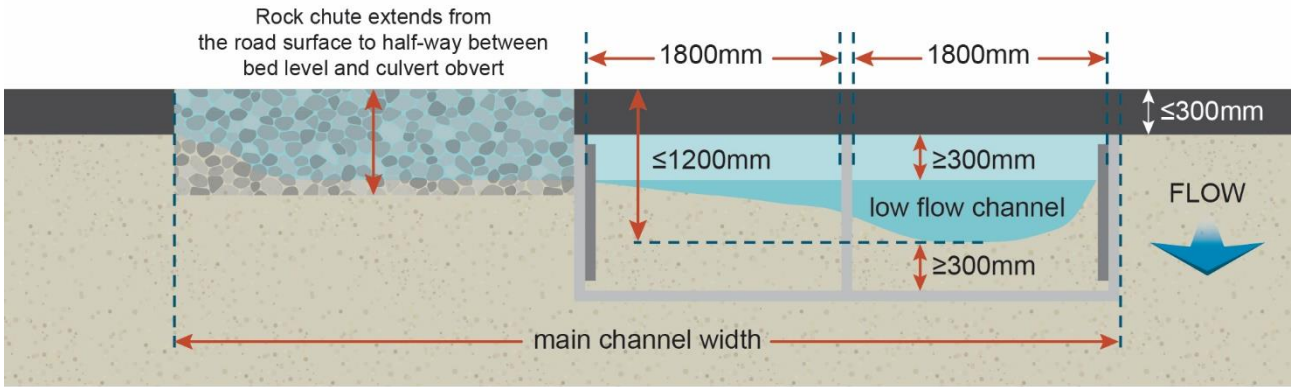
Culvert crossing option 3 (cross-section of waterway) – red waterway
